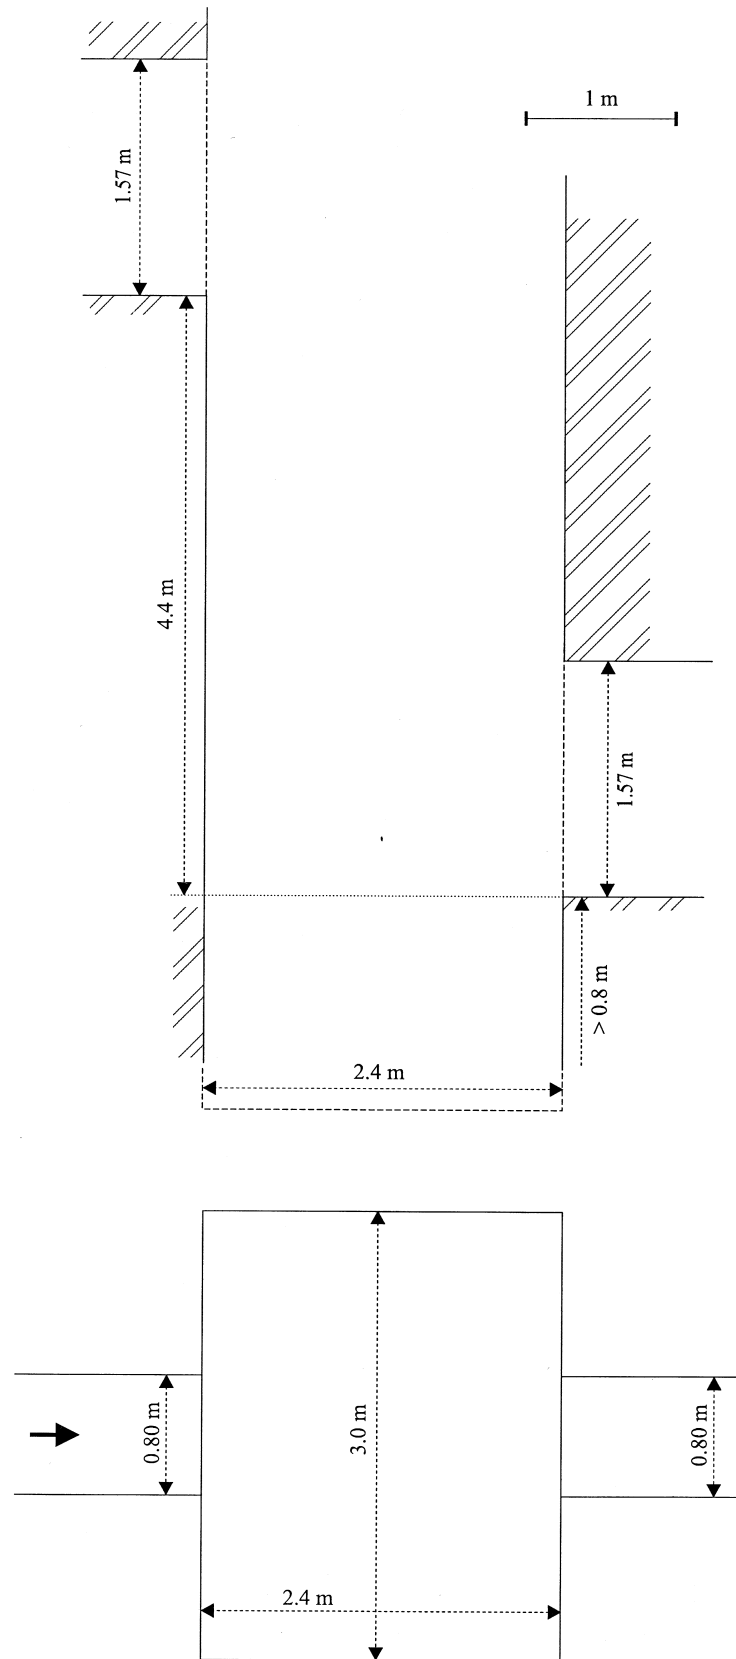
Dimensioned drawings of dropshafts. Brisecou Forest, Montjeu aqueduct.
